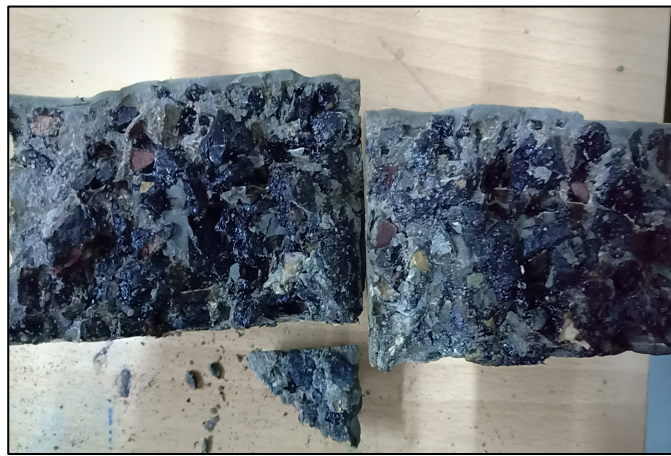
Full depth grouting at 24% Water content with less interconnectivity for OGFC
